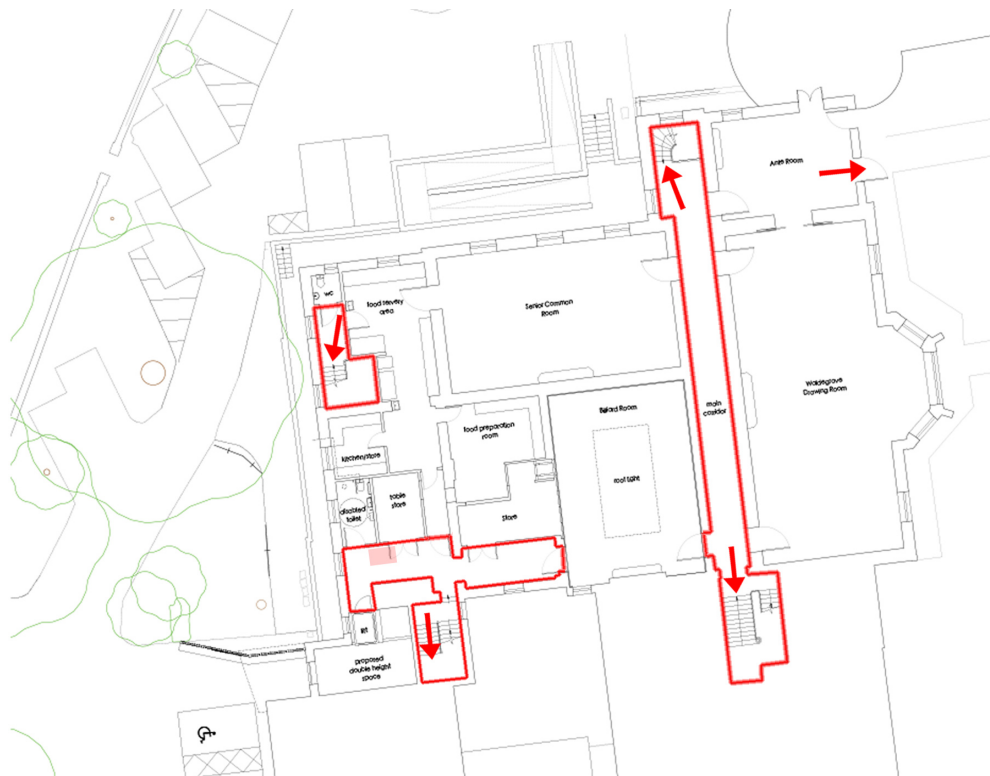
First floor plan showing protected corridor, key escape routes and the disabled refuge.
